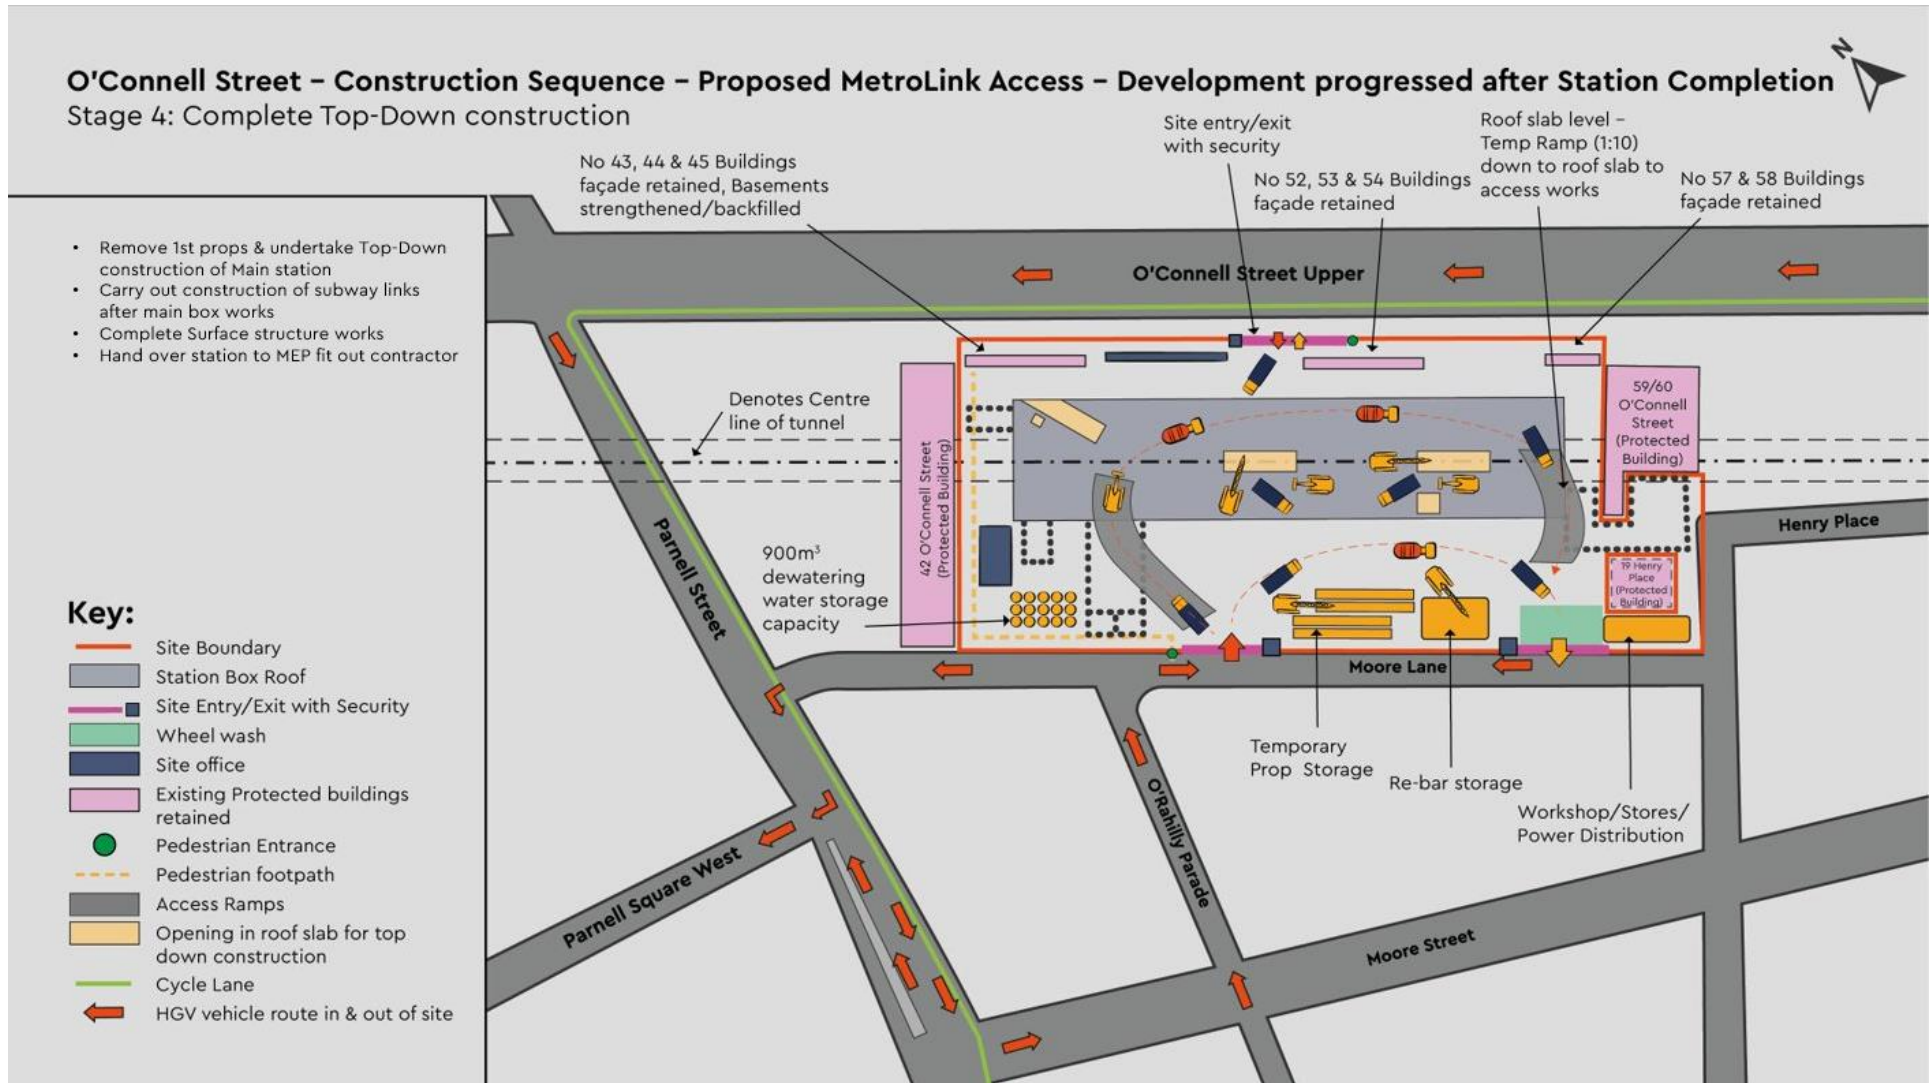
O'Connell Street Stage 4 – Complete Top-down construction
